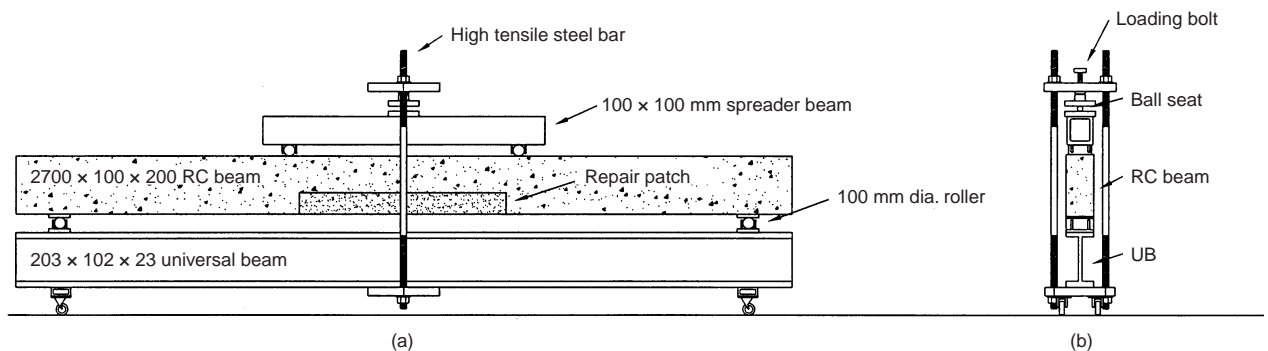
Repaired reinforced concrete beam under sustained loading: (a) elevation; and (b) end view
